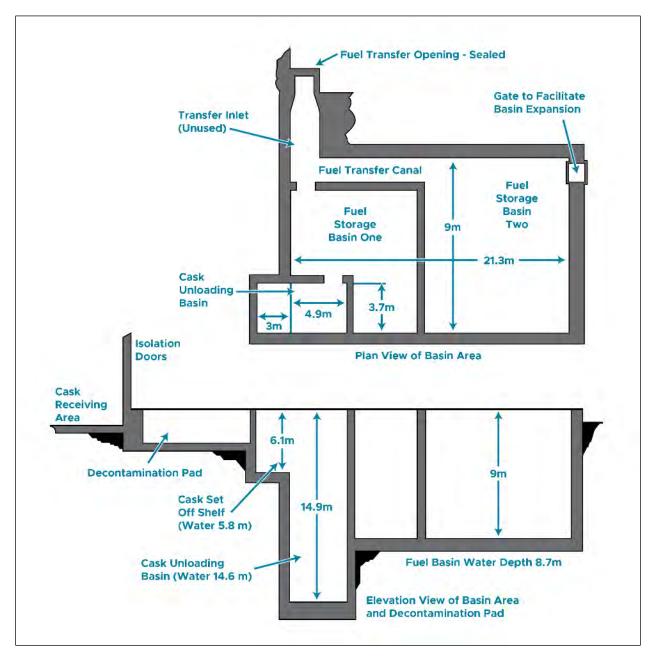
Plan and Elevation Views of Basin Area and Decontamination Pad at the Morris Site
